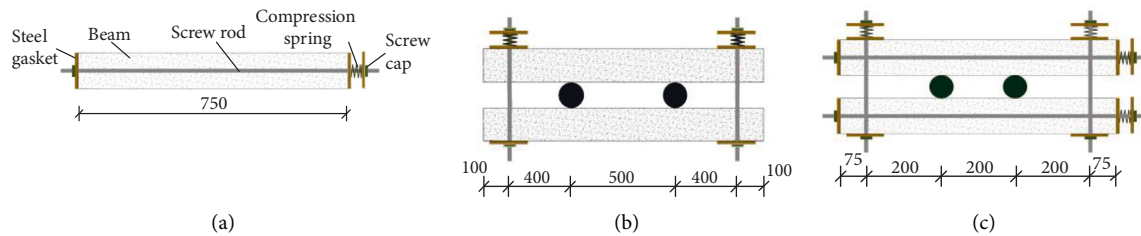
Force-holding devices and specimens. (a) Holding device in SP3 to apply axial force. (b) Holding device in SP4 to apply bending moment. (c) Holding device in SP5 to apply compression and bending moment (unit: mm).
